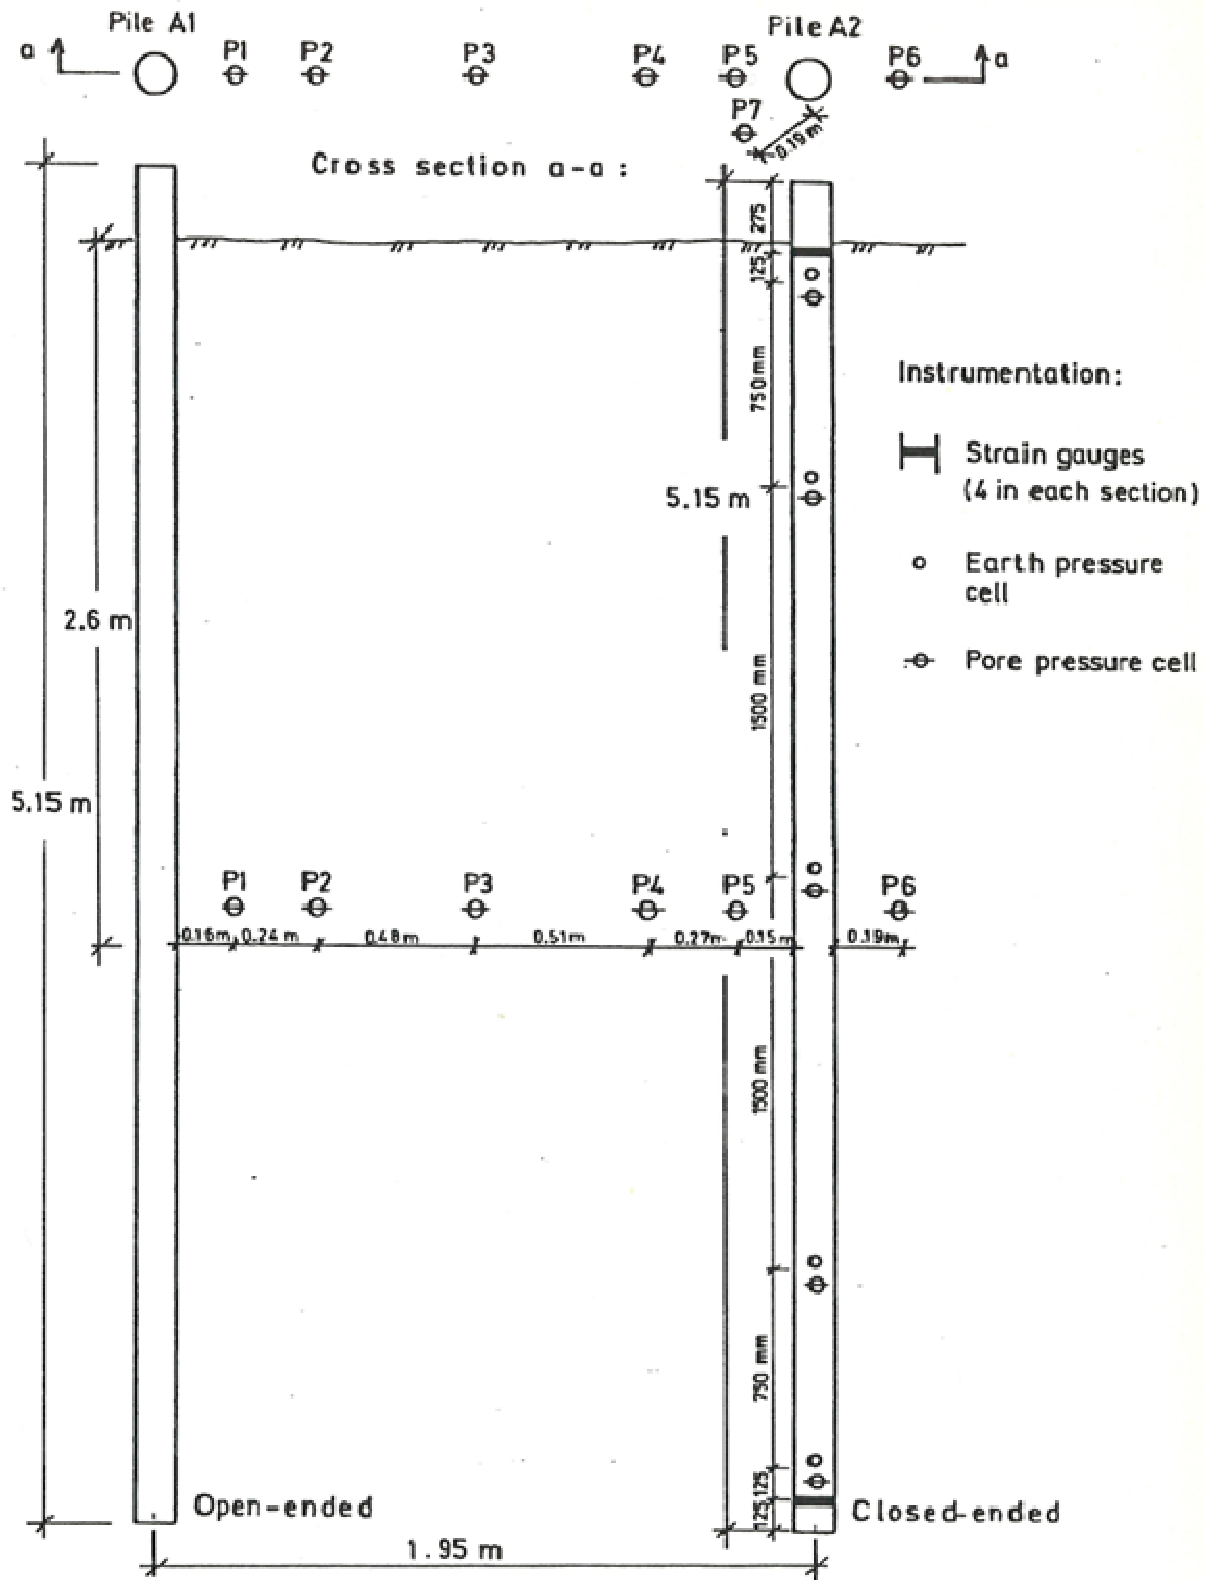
Instrumentation in connection with test piles A1 and A2, Haga (from Karlsrud and Haugen, 1983)
